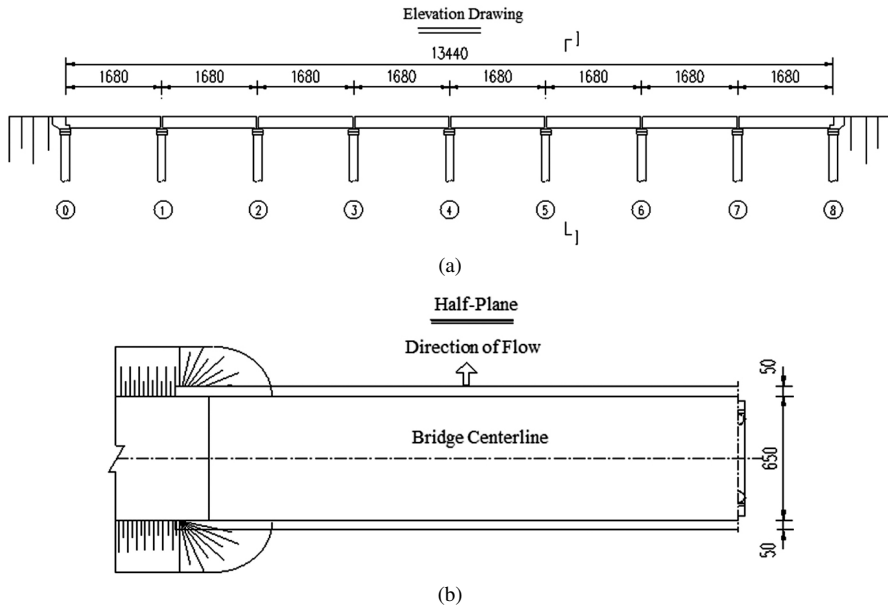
Bridge layout plan (unite: cm): (a) Vertical view, (b) Plane figure
